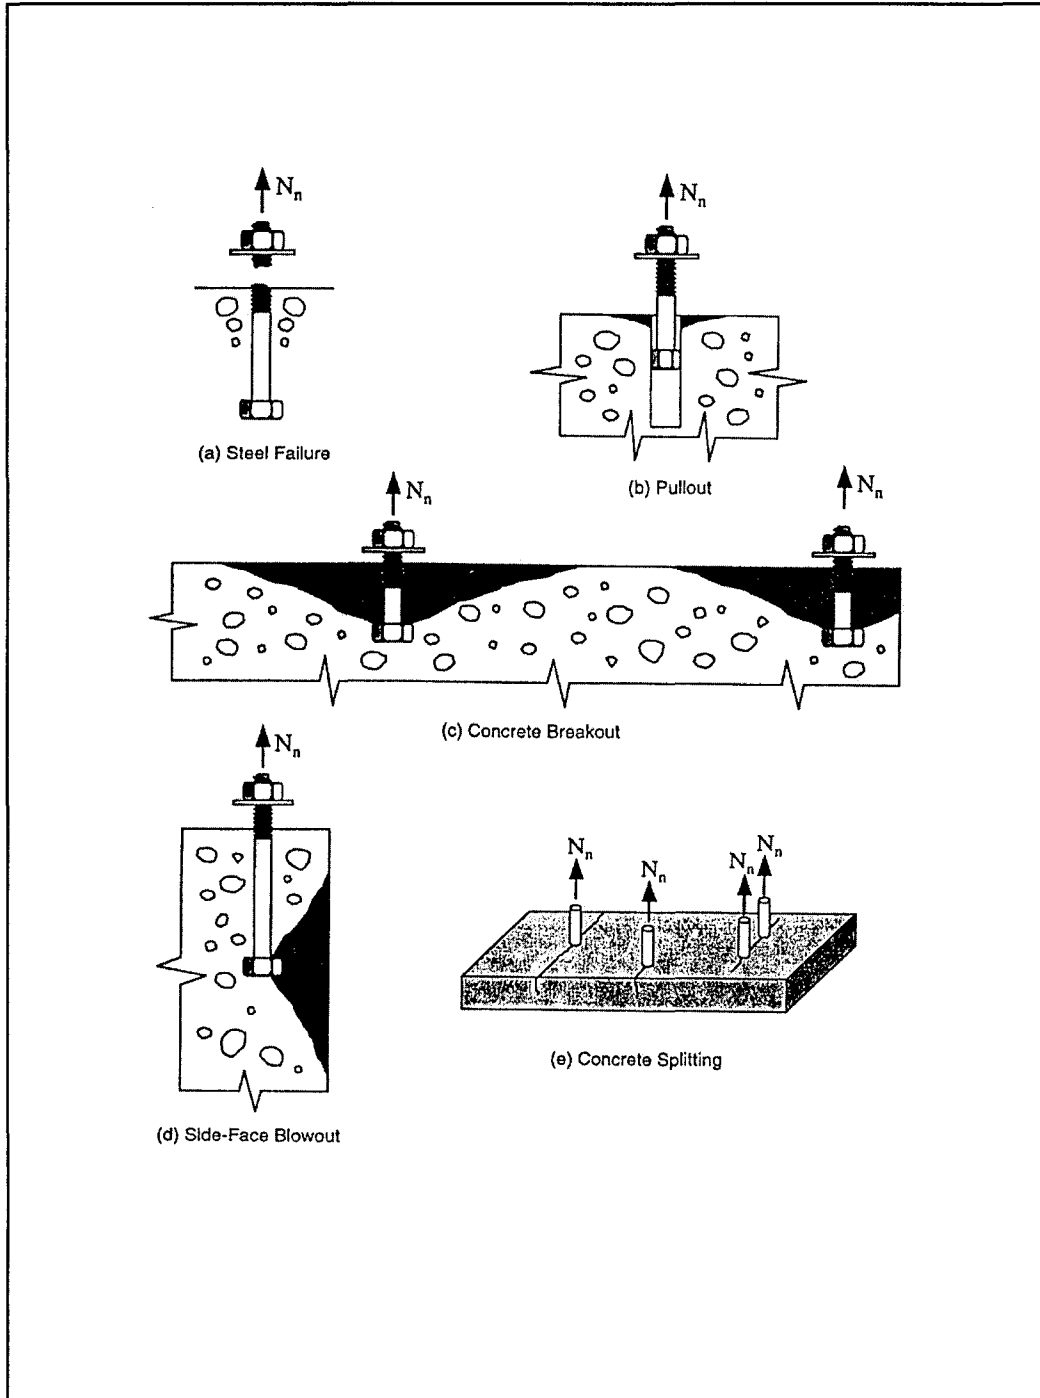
Failure modes for anchors under tensile loading.
